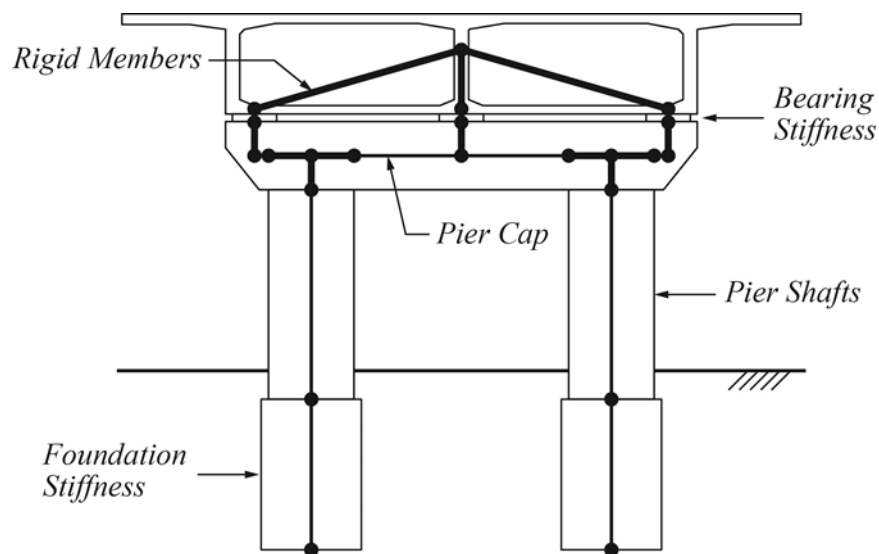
3D Model for Bridge in Design Example 2 at the Piers
